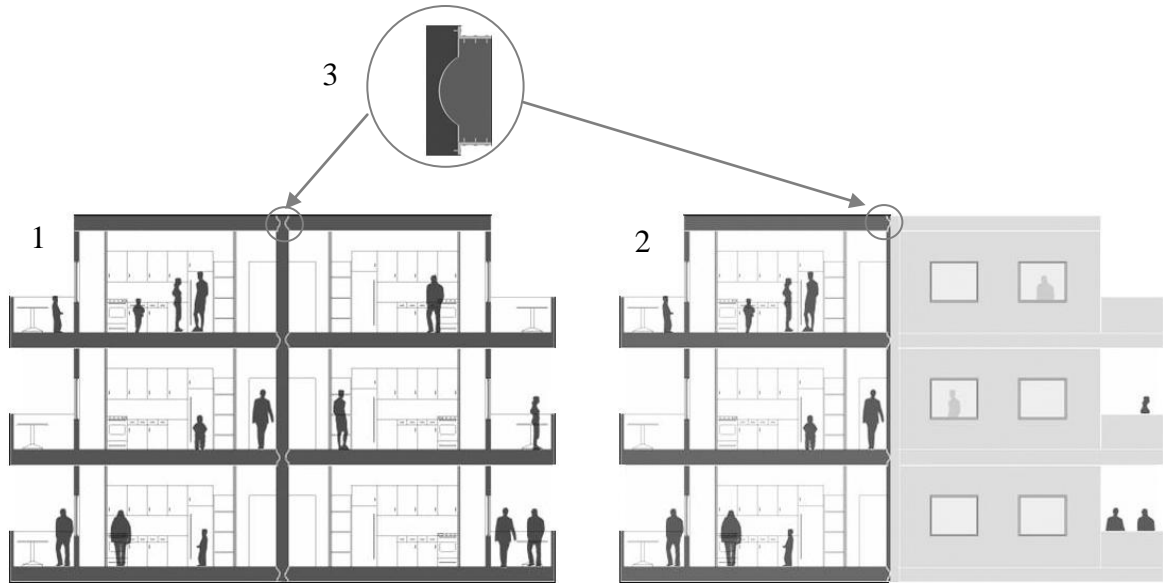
(1) Section cut of modules being stacked with (2) elevation of façade; (3) detail of shear release.
